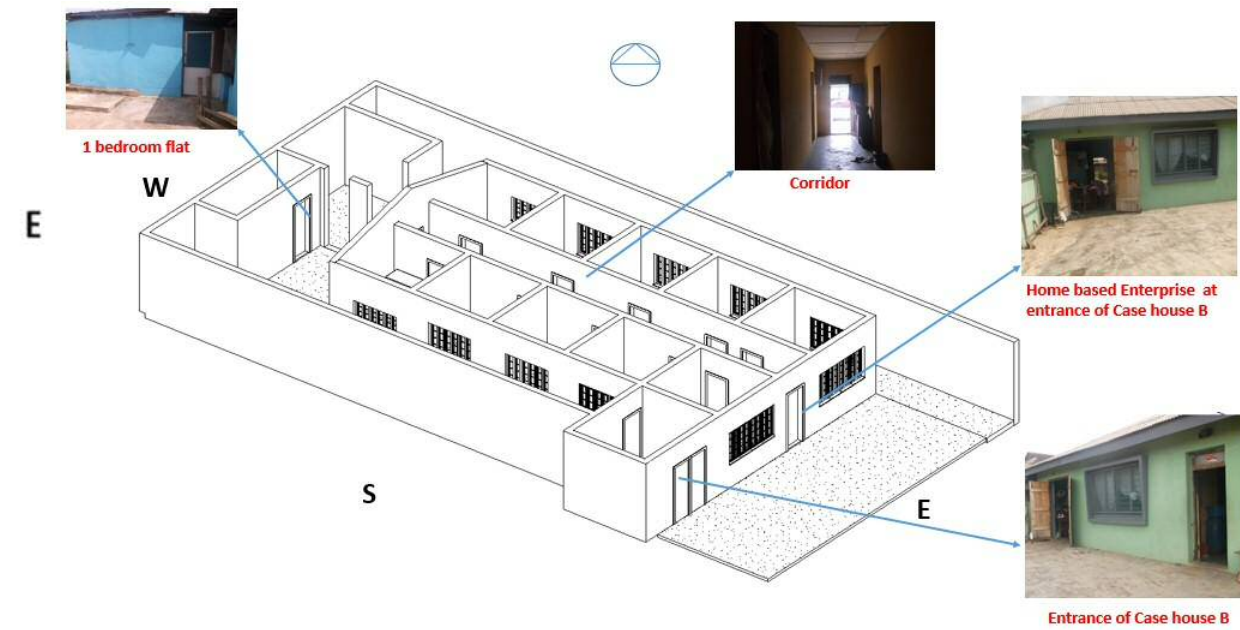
Layout of Case Study House B, source: Author, 2014
